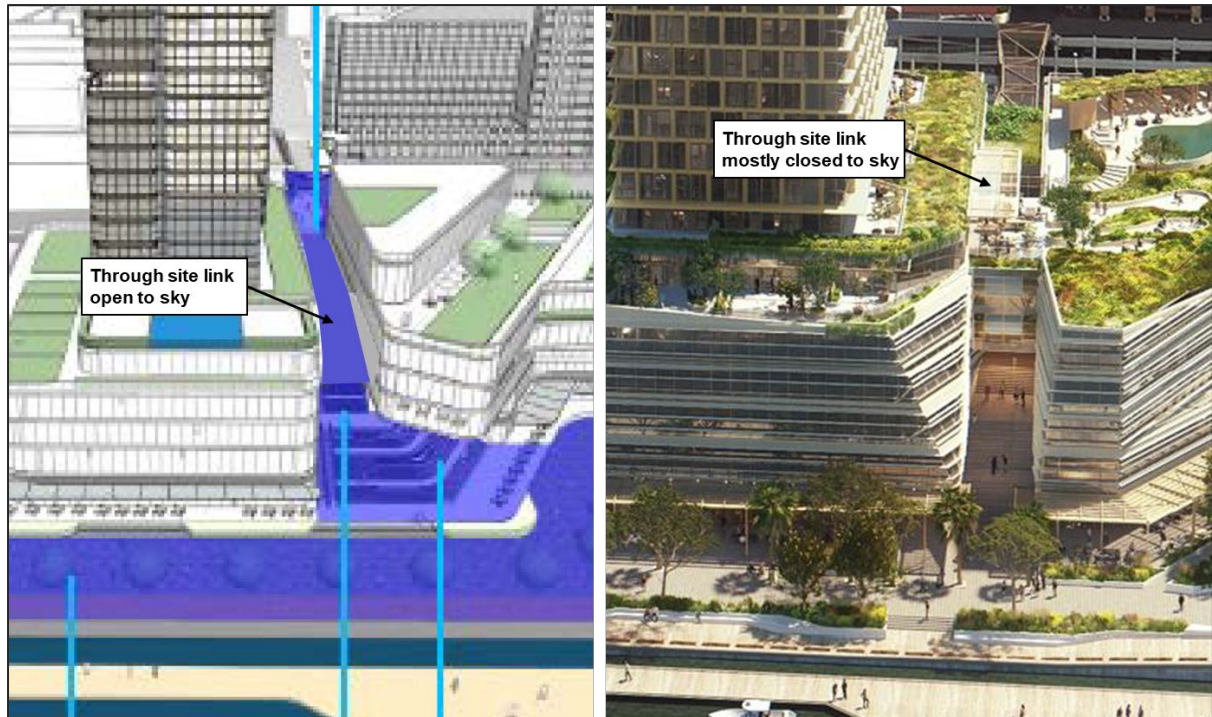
| Concept Approval reference scheme (left) SSD proposed through site link (right) Bunn Street through site link (Base source: SSD 7874 and Applicant's EIS)
